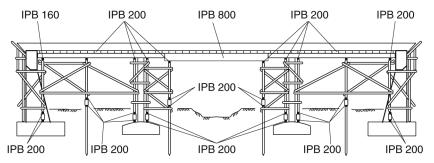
Elevation of scaffolding for the Wallenhorst railway overbridge. 1966, Case 11.9
